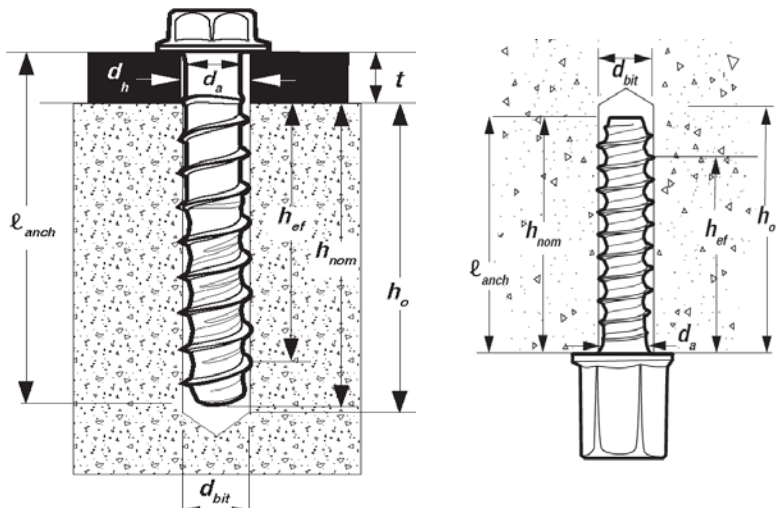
A—SCREW-BOLT+ ANCHOR DETAIL (Left Picture) AND HANGERMATE+ ANCHOR DETAIL (Right Picture)
